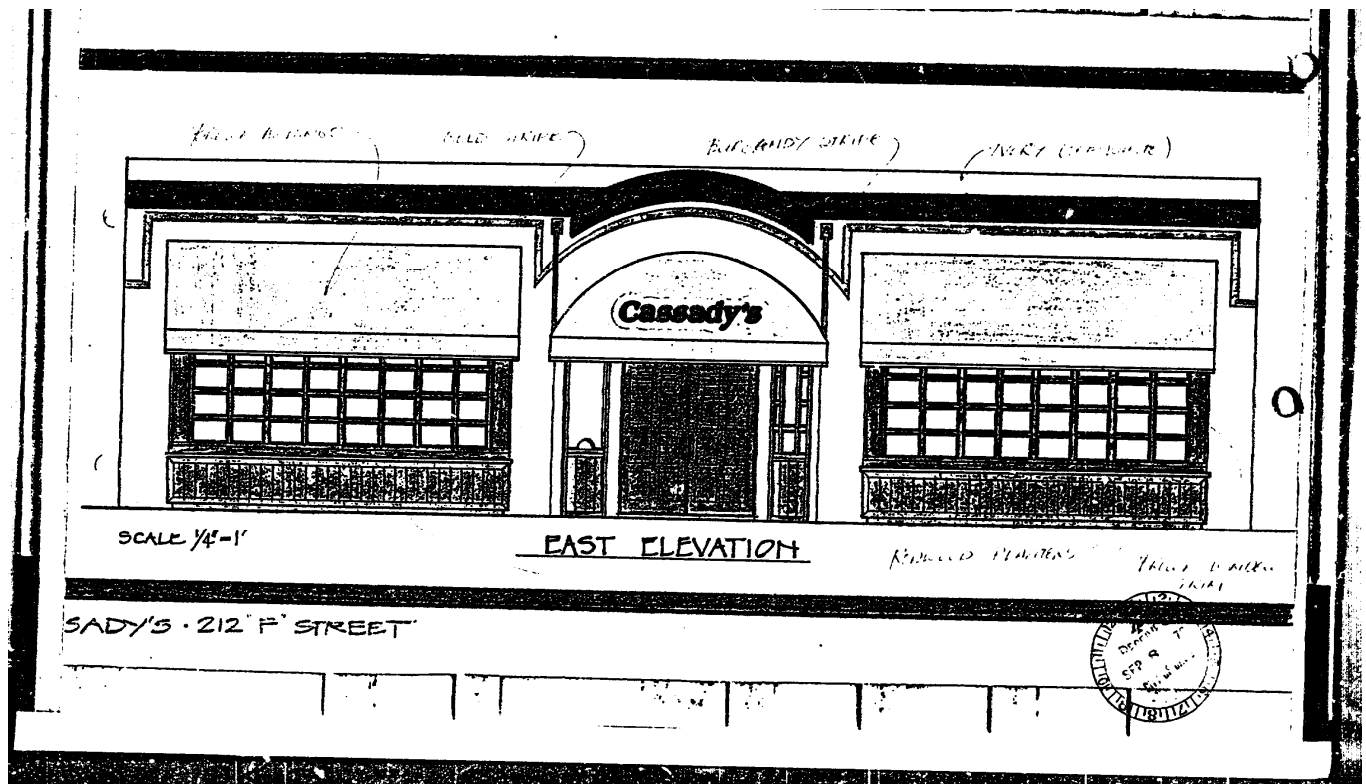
c. 1976 remodel for Cassidy's Restaurant (the elevation is of the west façade, not the east as noted)
